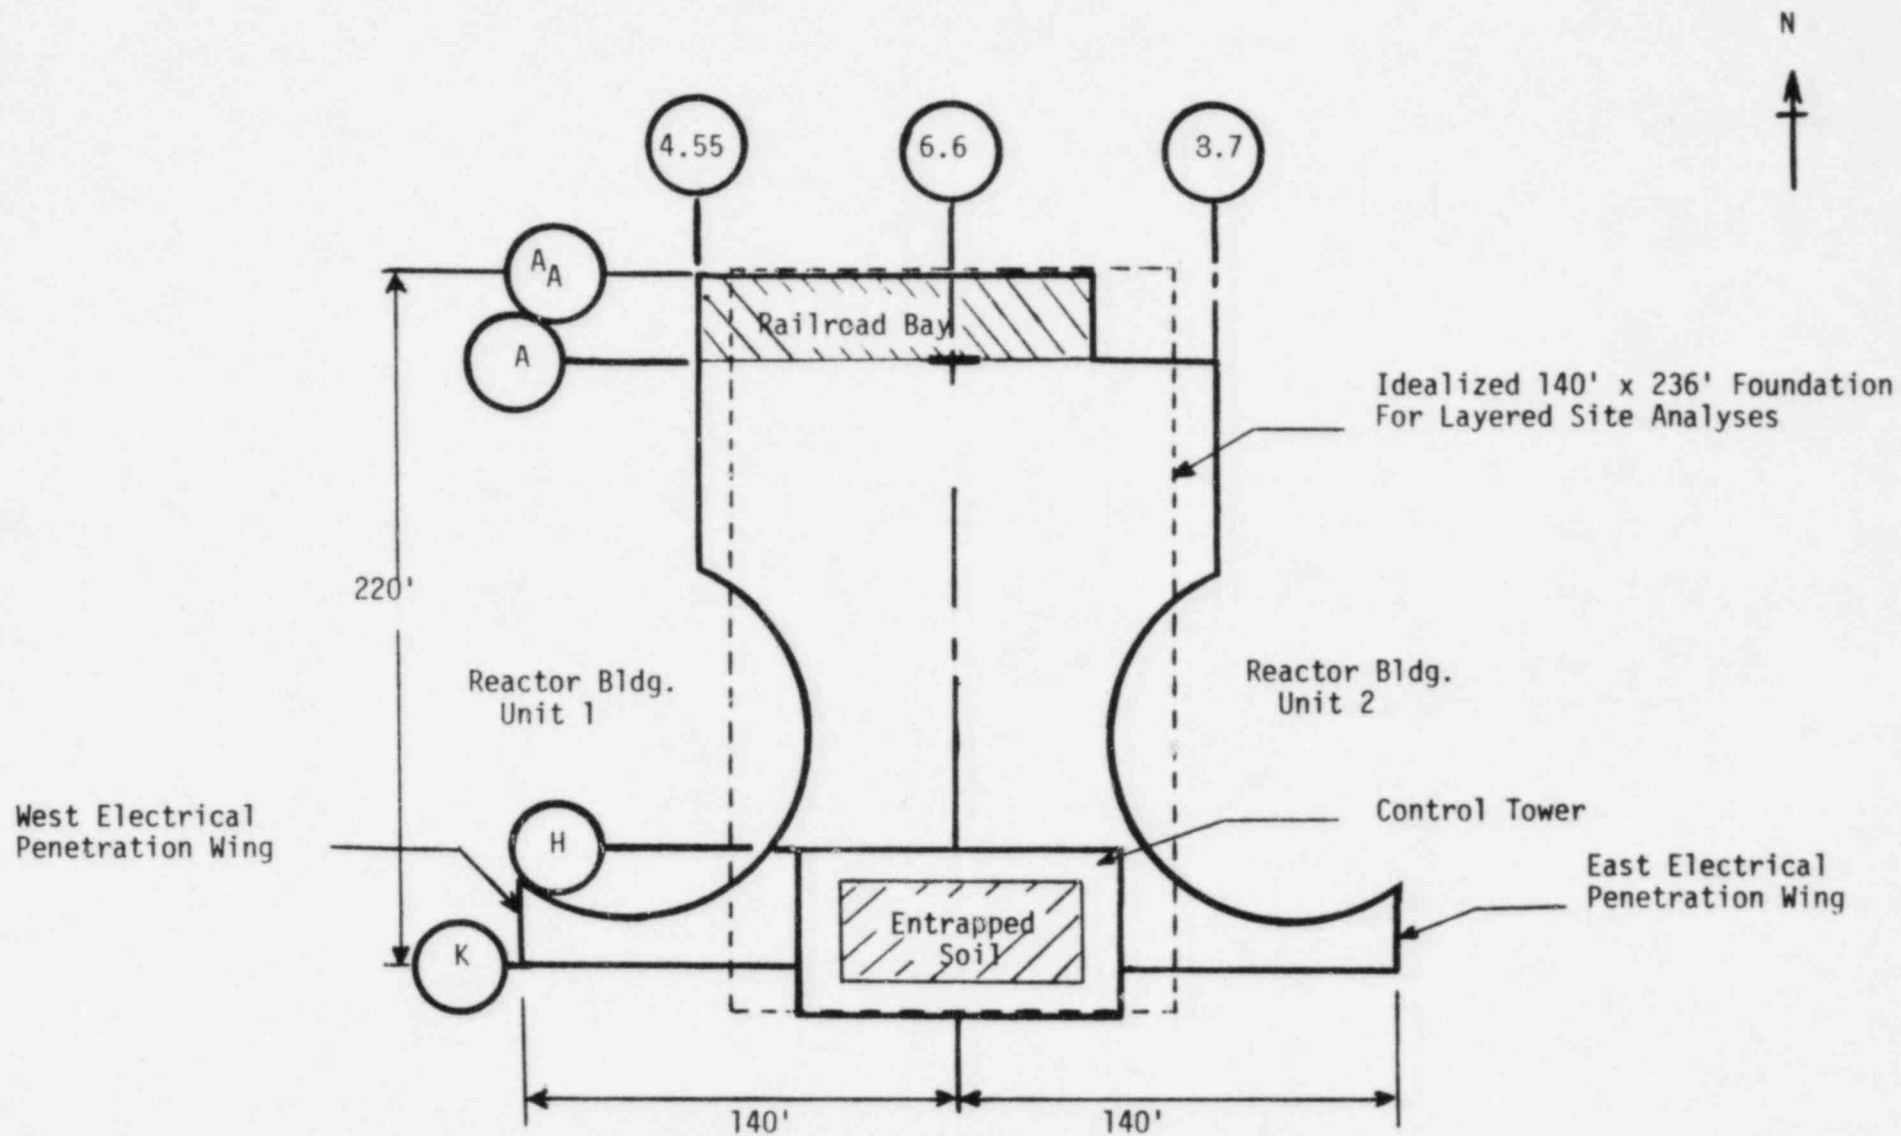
SCHEMATIC REPRESENTATION OF AUXILIARY BUILDING FOUNDATION SHOWING IDEALIZED FOUNDATION USED IN LAYERED SITE ANALYSES
